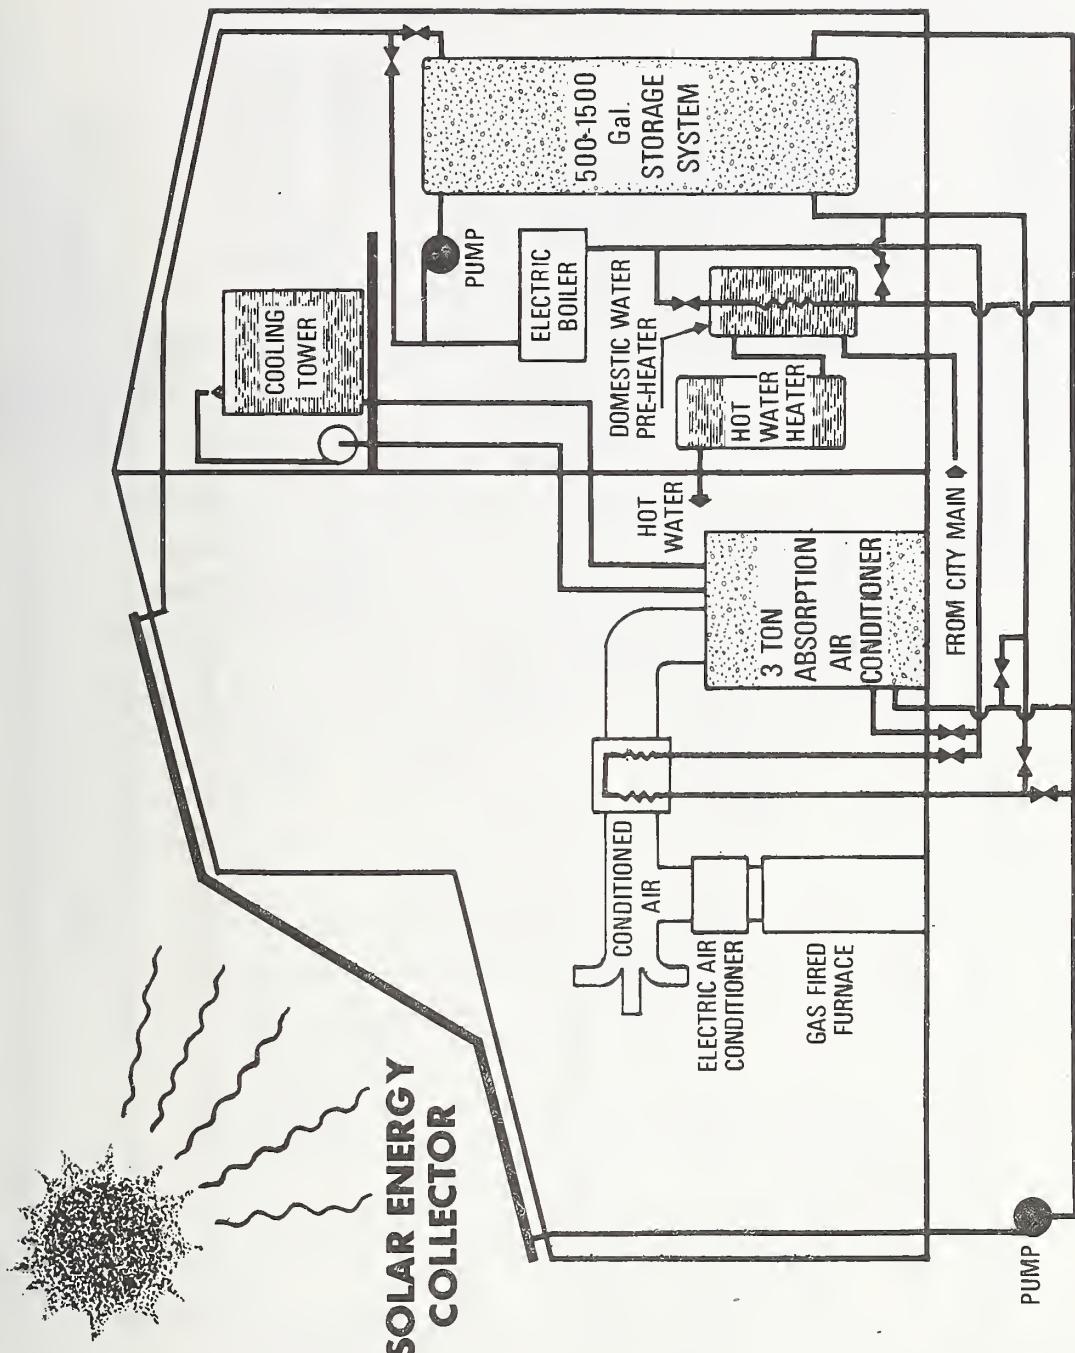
Schematic of the solar heating and cooling system in the NBS test house.
